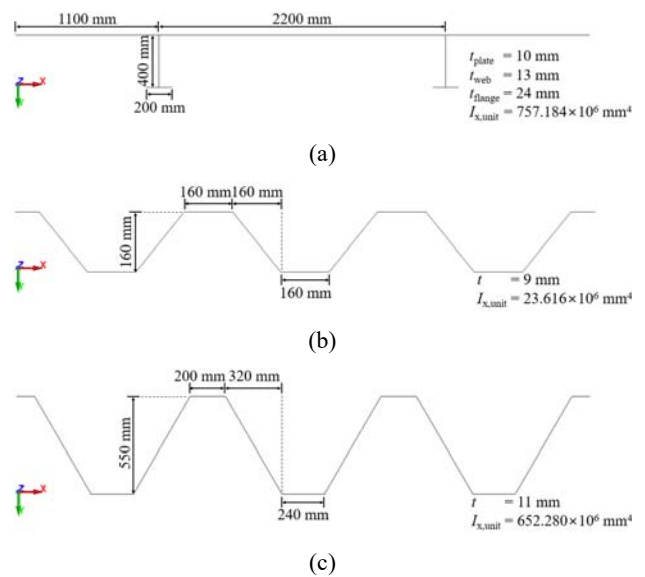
Comparison of cross-sectional configurations of blast wall types: (a) stiffened blast wall, (b) corrugated blast wall with intermediate section, and (c) corrugated blast wall with deep section
